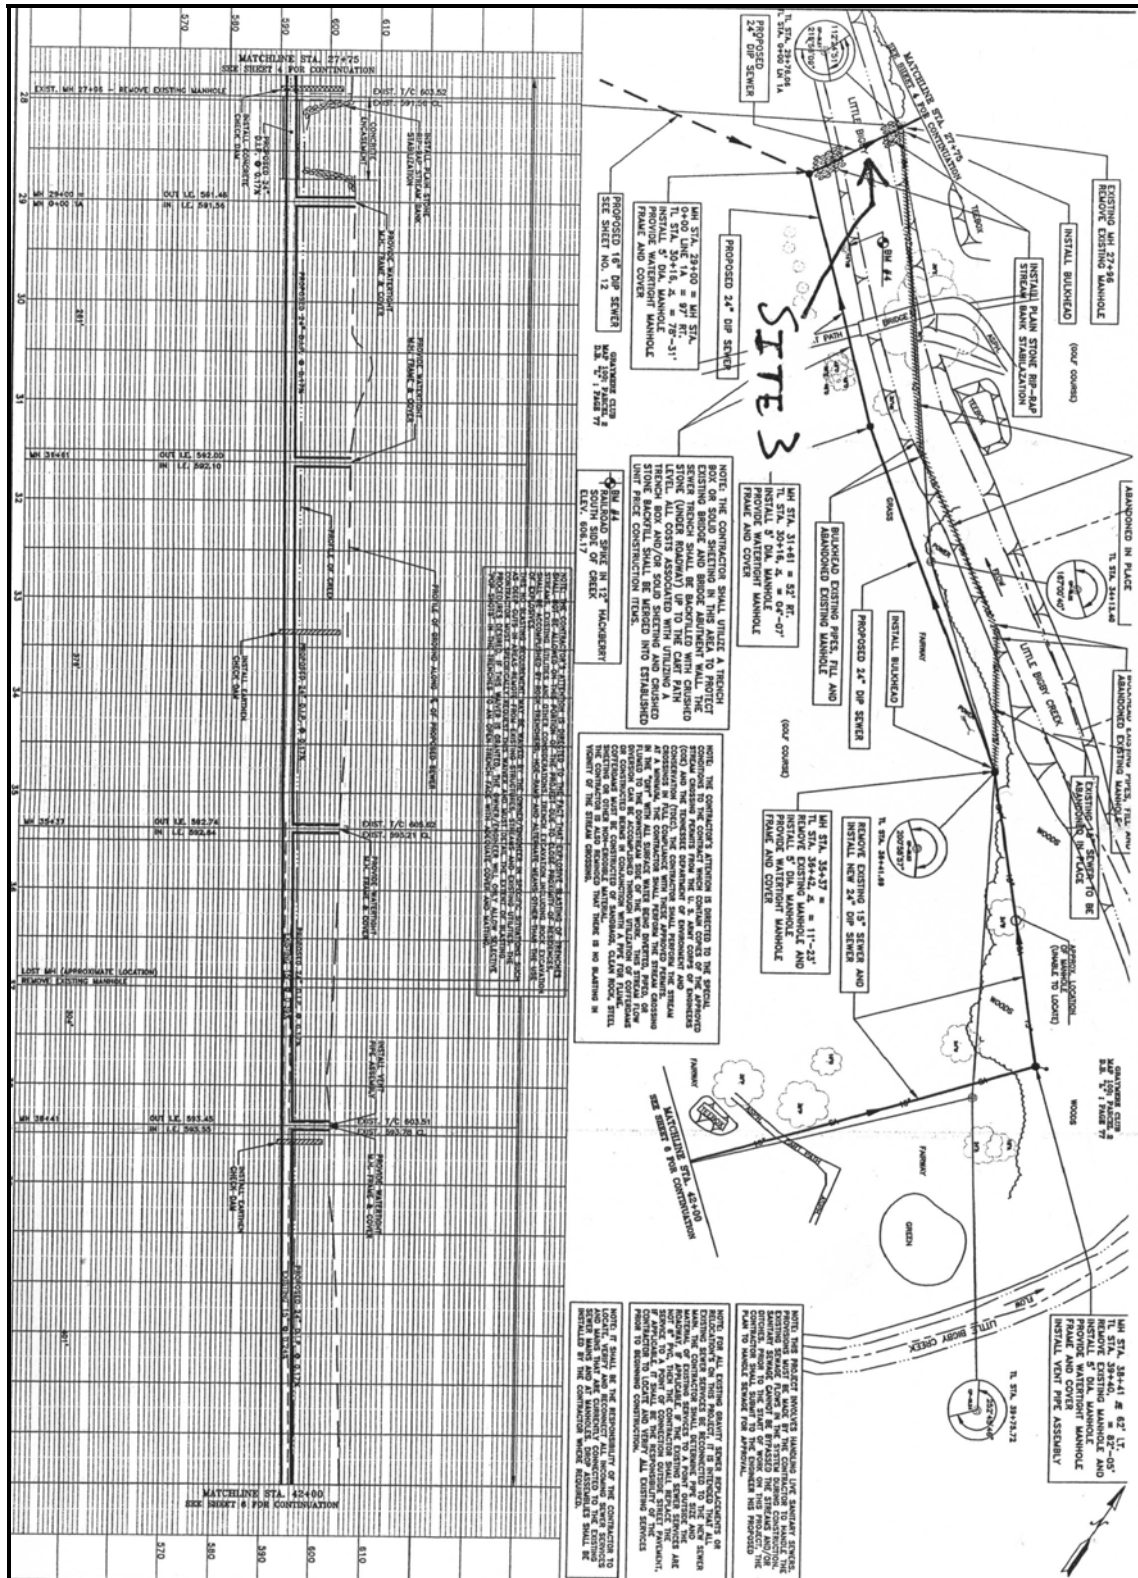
Plan sheet 5, site 3 on Little Bigby (replacement crossing)
